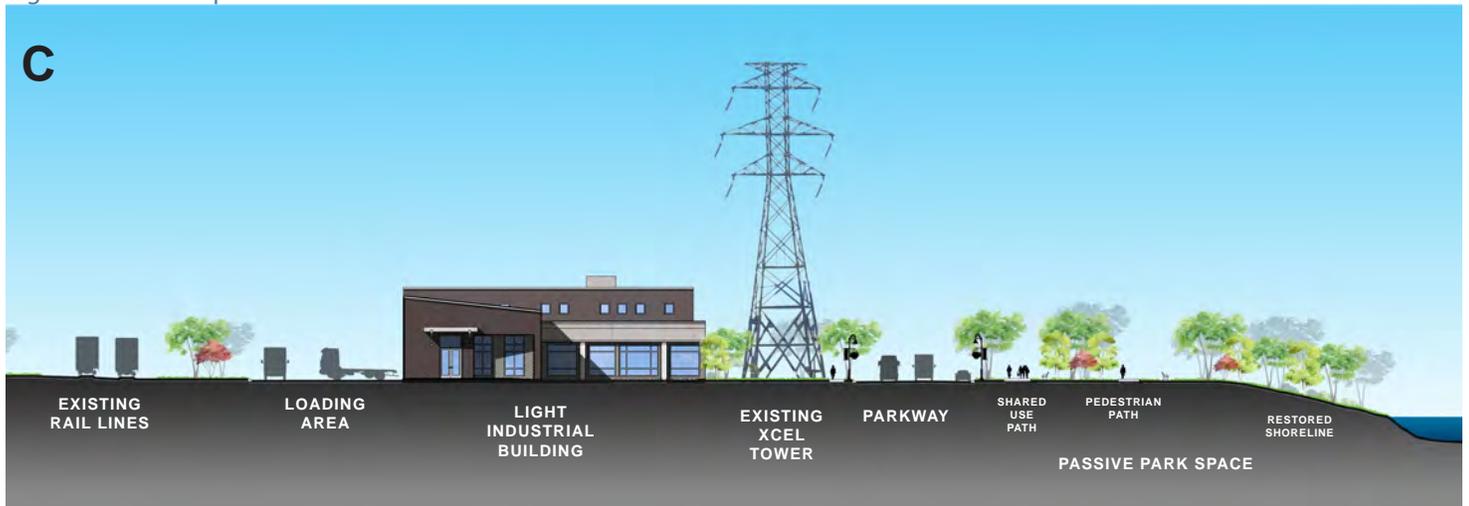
Concept Two - North Site Section-Elevation (East)
